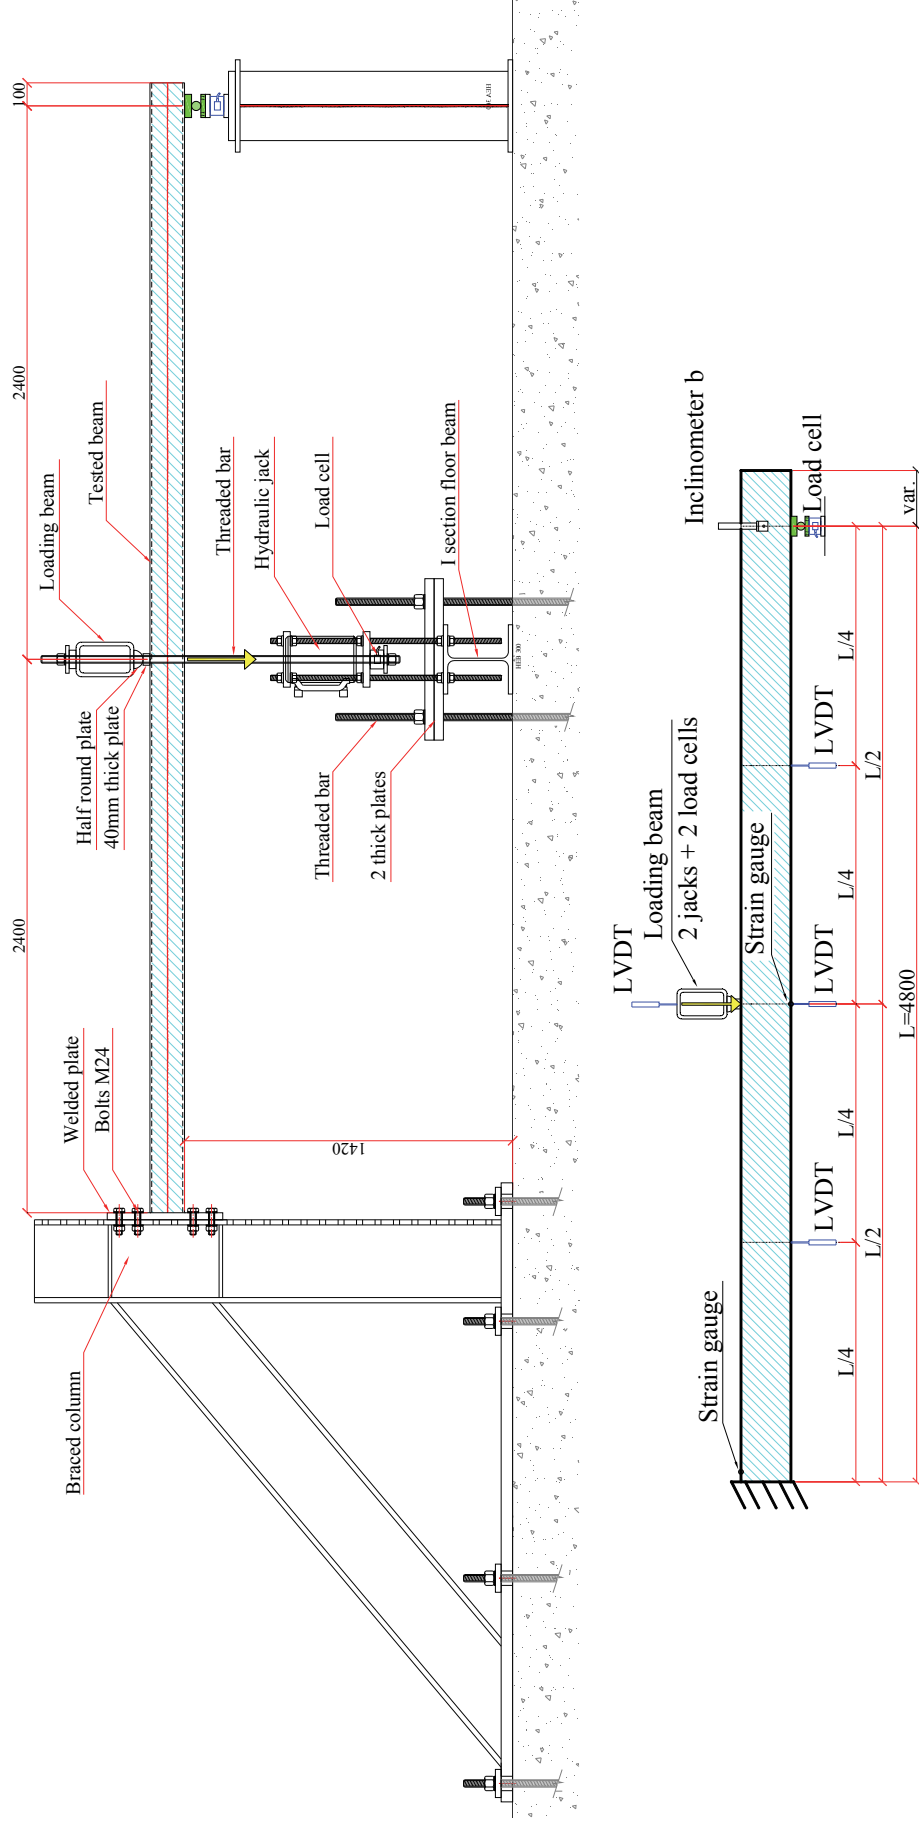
Test setup of the propped cantilever centrally loaded
